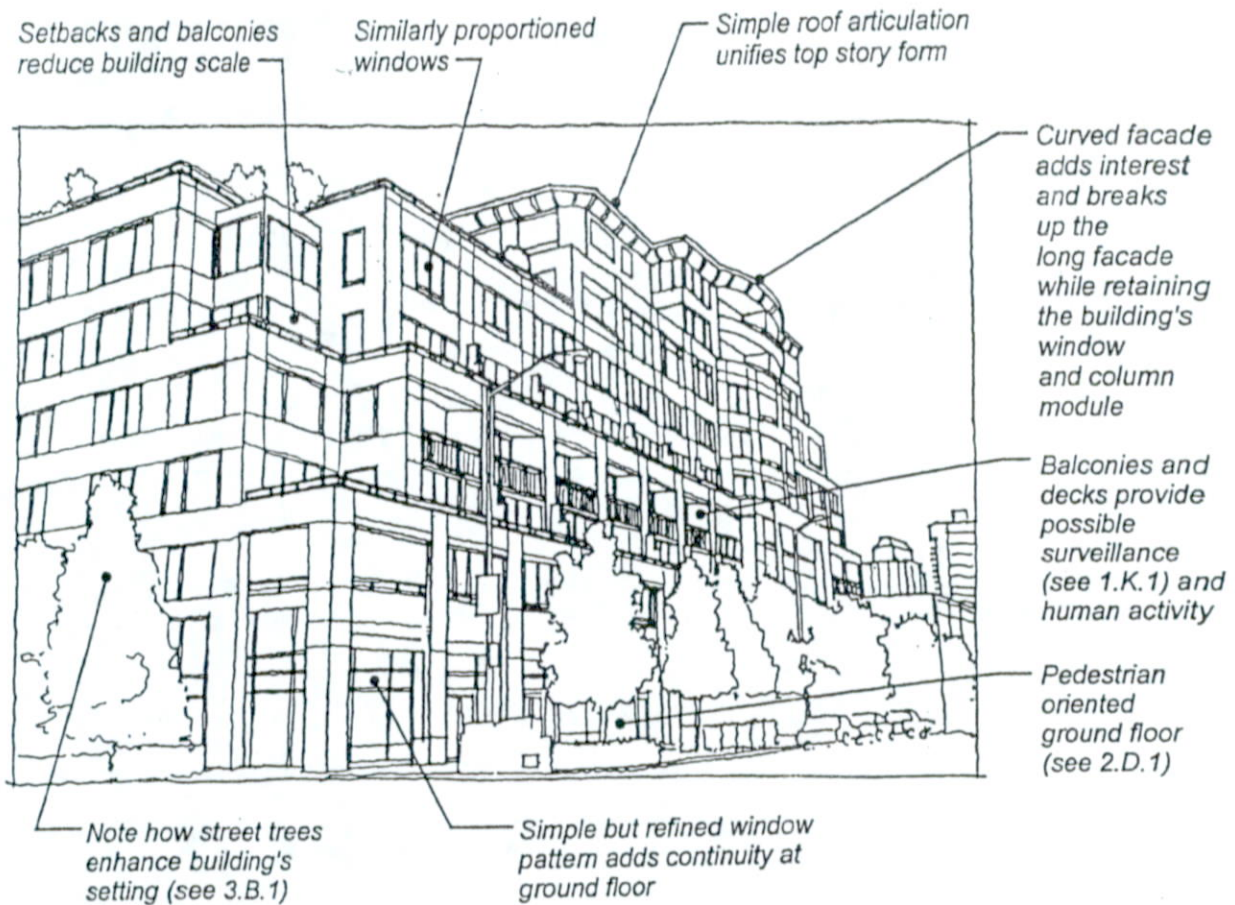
C.4: Consistent and appropriate building details help this large development maintain human scale. Note that the similar proportions and continuous building elements (such as horizontal beams and the break-up of ground floor windows) help to unify the building's architectural composition.
